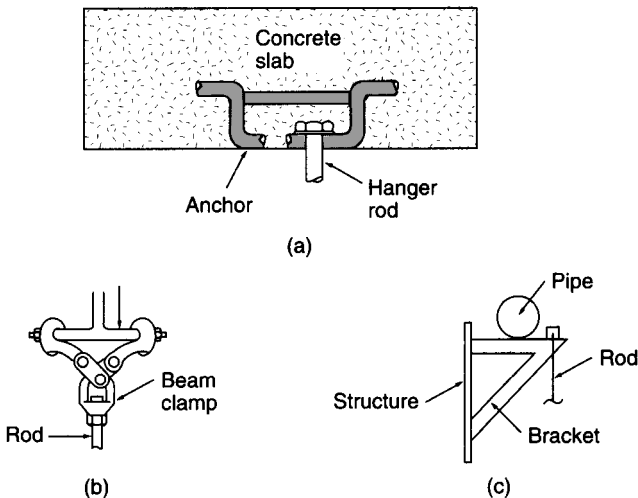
Typical structure attachments. (a) Insert; (b) beam clamp; (c) bracket.
